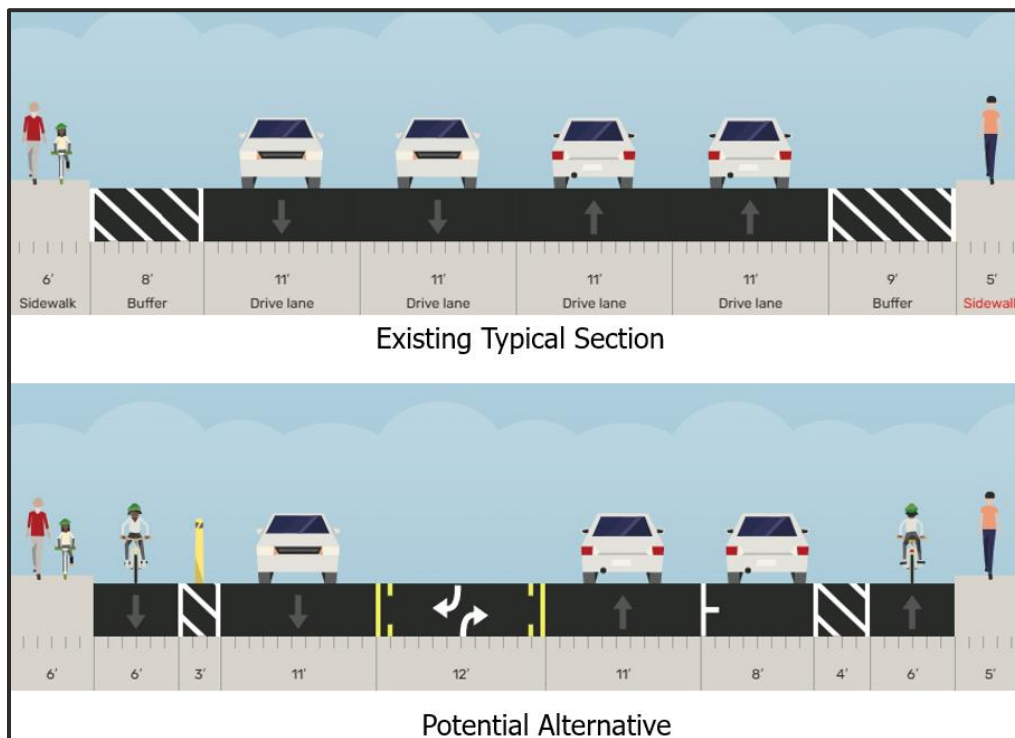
Dr. Martin Luther King Boulevard Existing and Potential Alternative Typical Section
